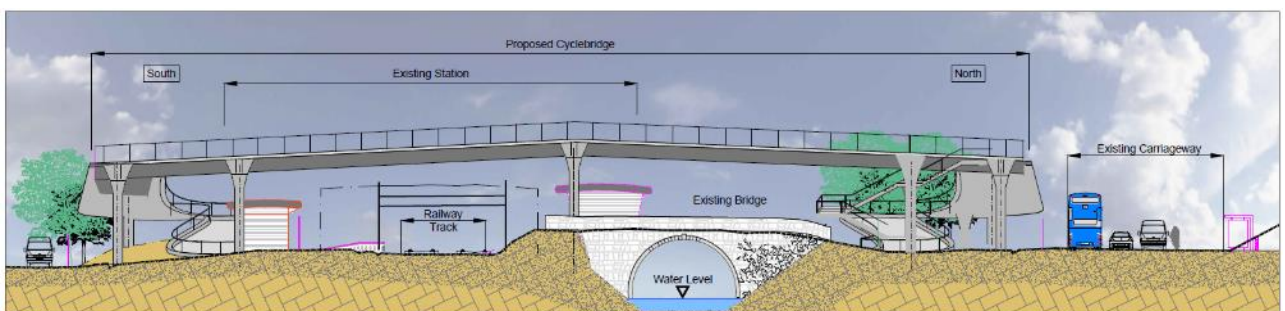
Clonsilla Emerging Preferred Option: Cycle Bridge - Sectional Elevation
